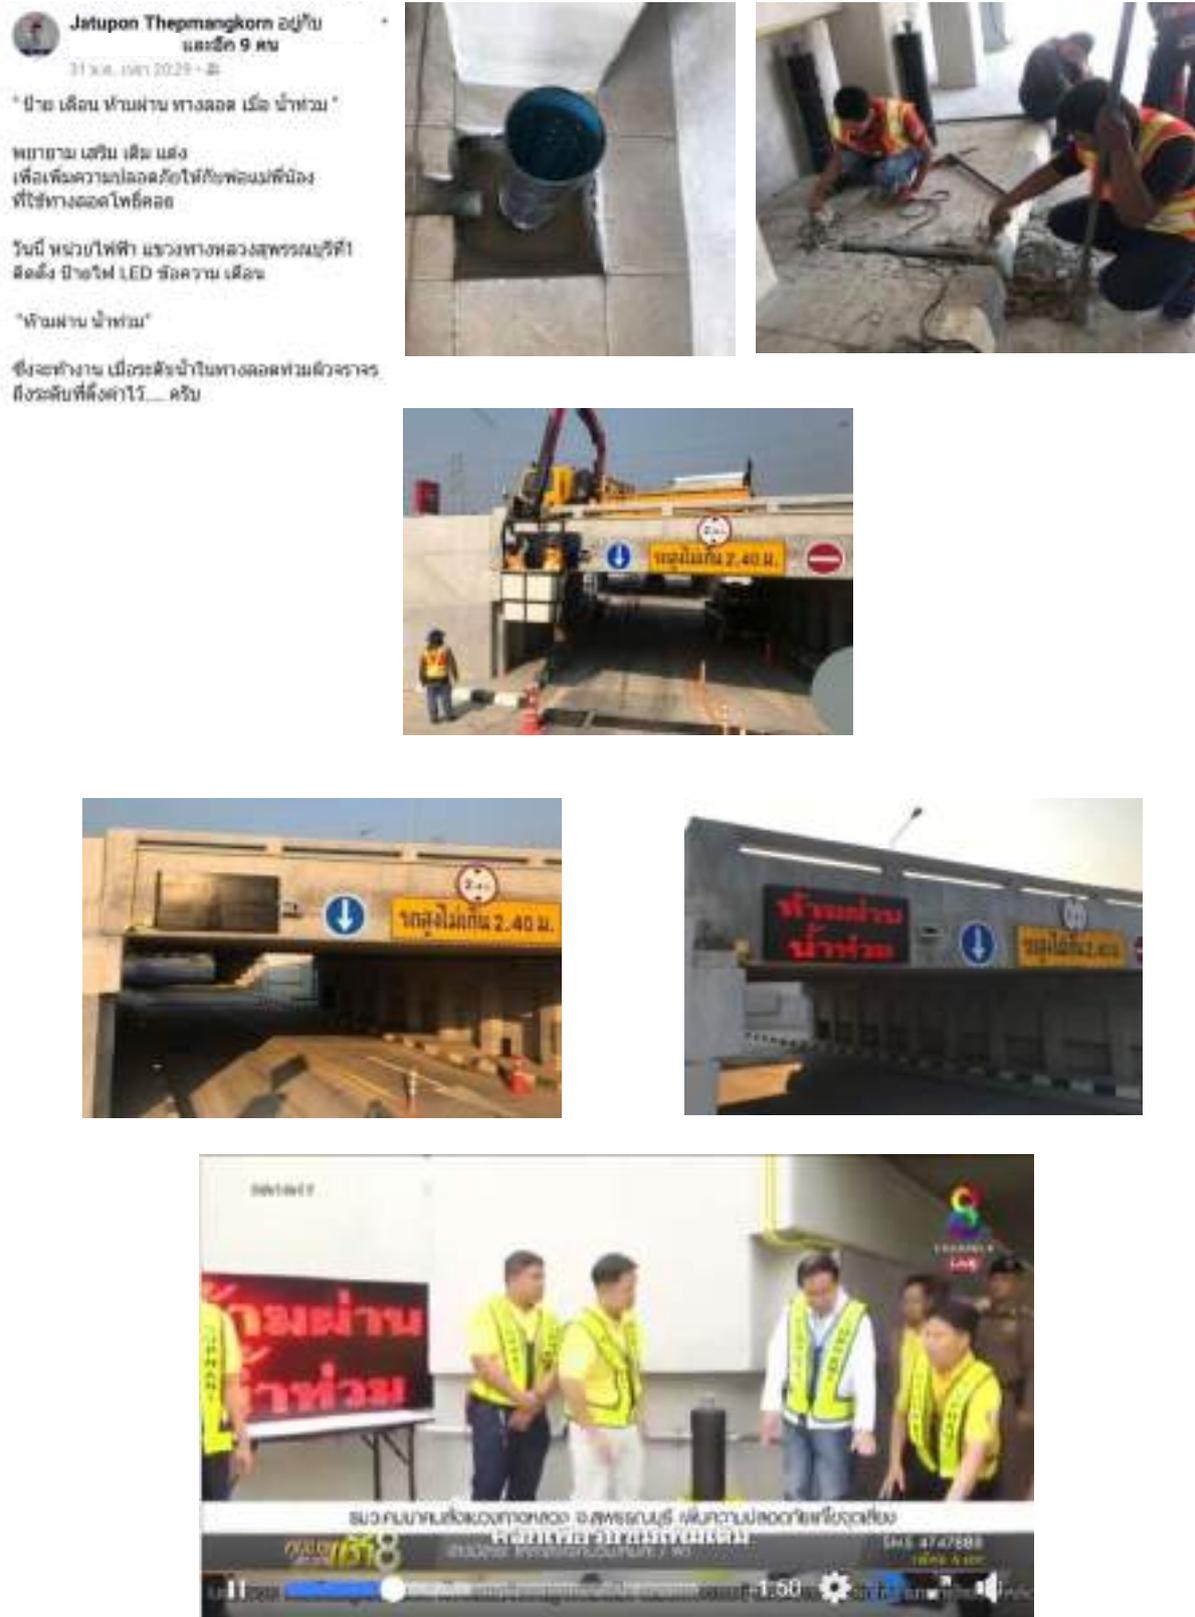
The installation of warning sign system in case of flooding underpass (LED warning sign flashing)
